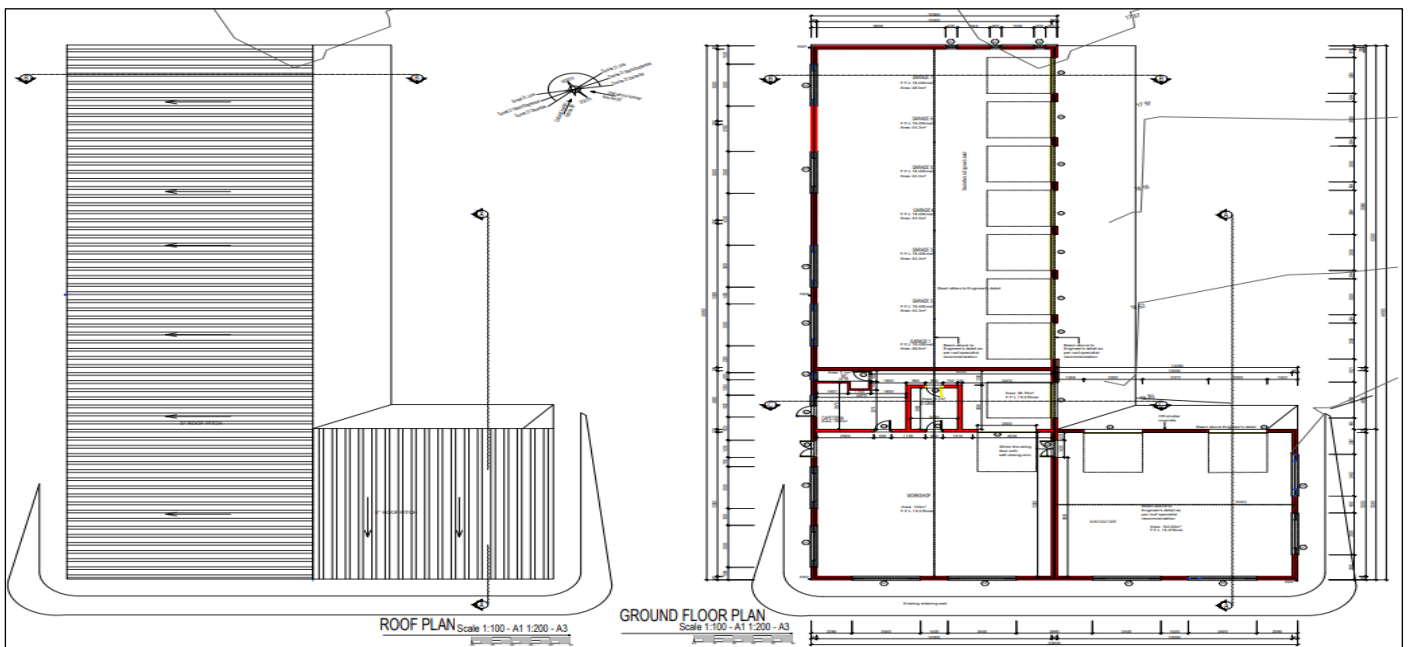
Layout plan for proposed new Garages (TMBA, 2023)
